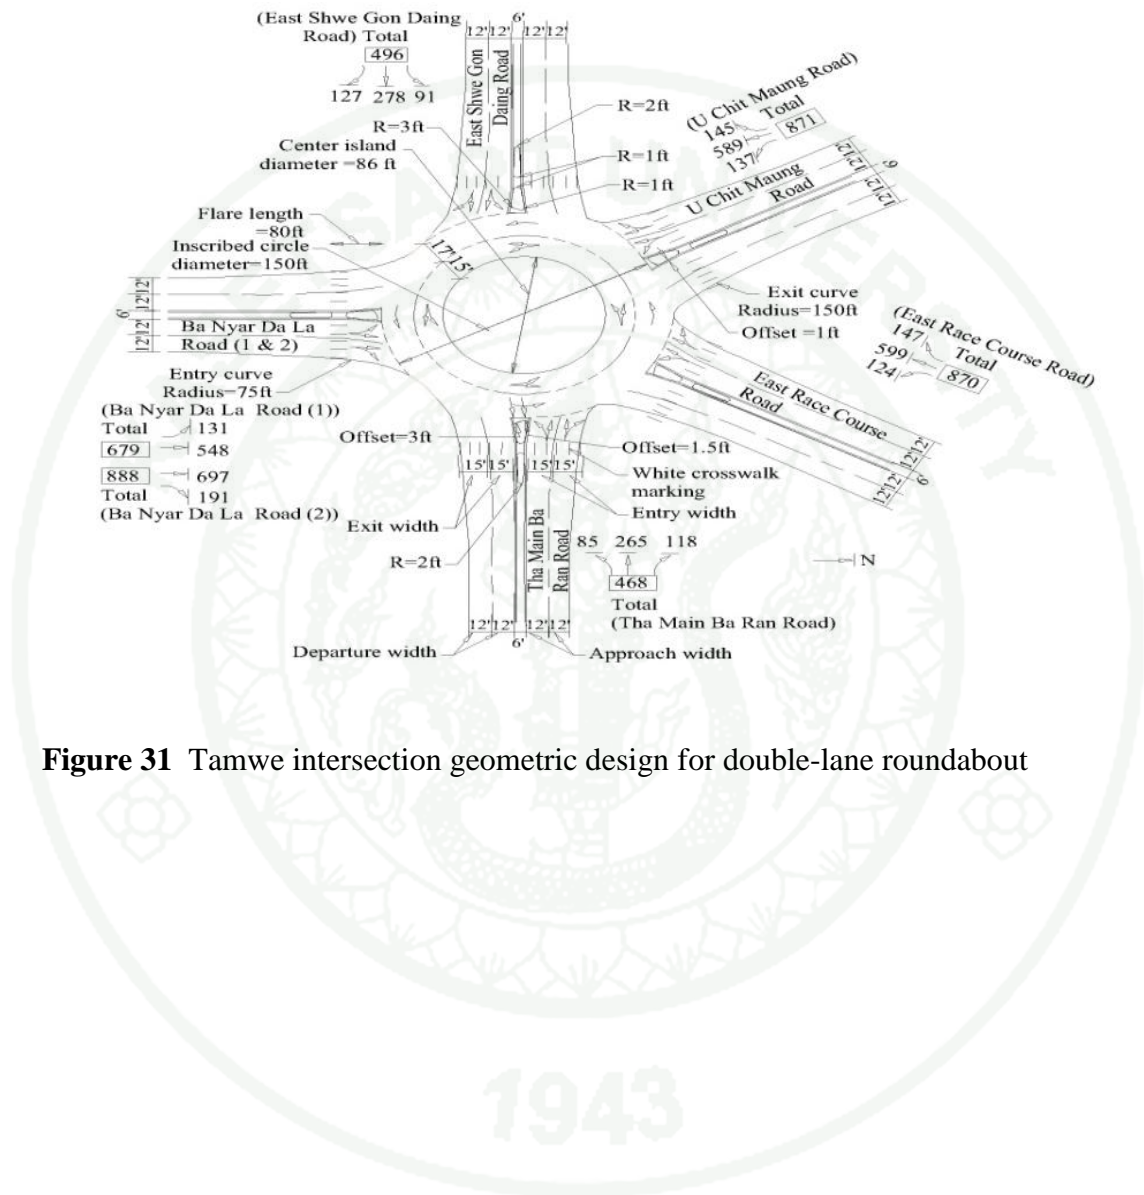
Tamwe intersection geometric design for double-lane roundabout
